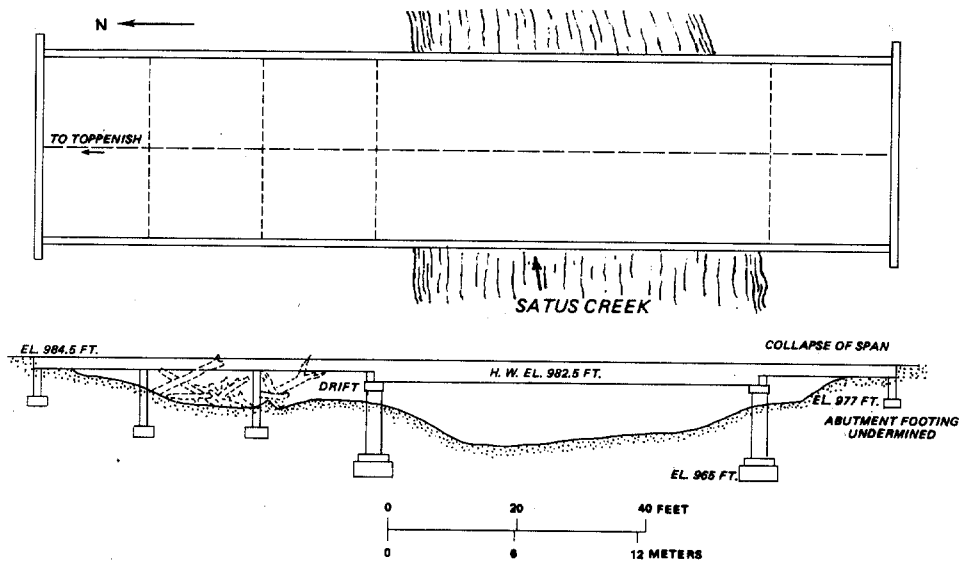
Sketch of plan (top) and elevation (bottom) for bridge at first crossing of Satus Creek.
